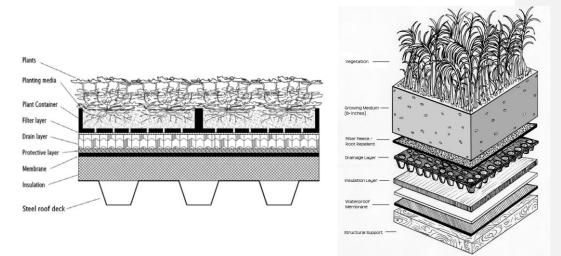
304-34. Extensive (L) and Intensive (R) Green Roof – Typical Sections (Source: Wark and Wark, 2003)
